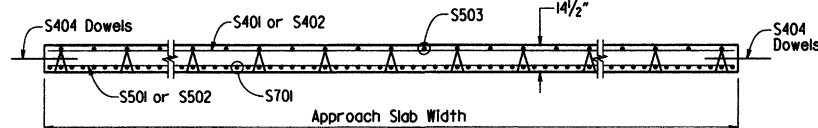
DETAILS OF LONGITUDINAL CONSTRUCTION JOINT
